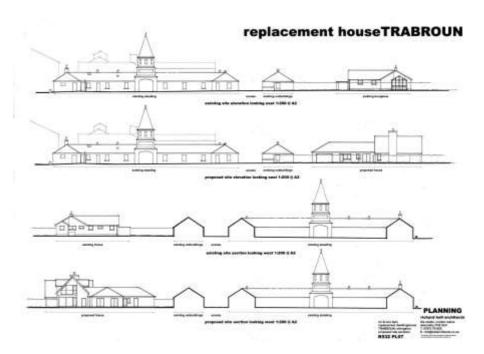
site sections showing relationship of existing bungalow and proposed replacement house, against the Listed steading.
